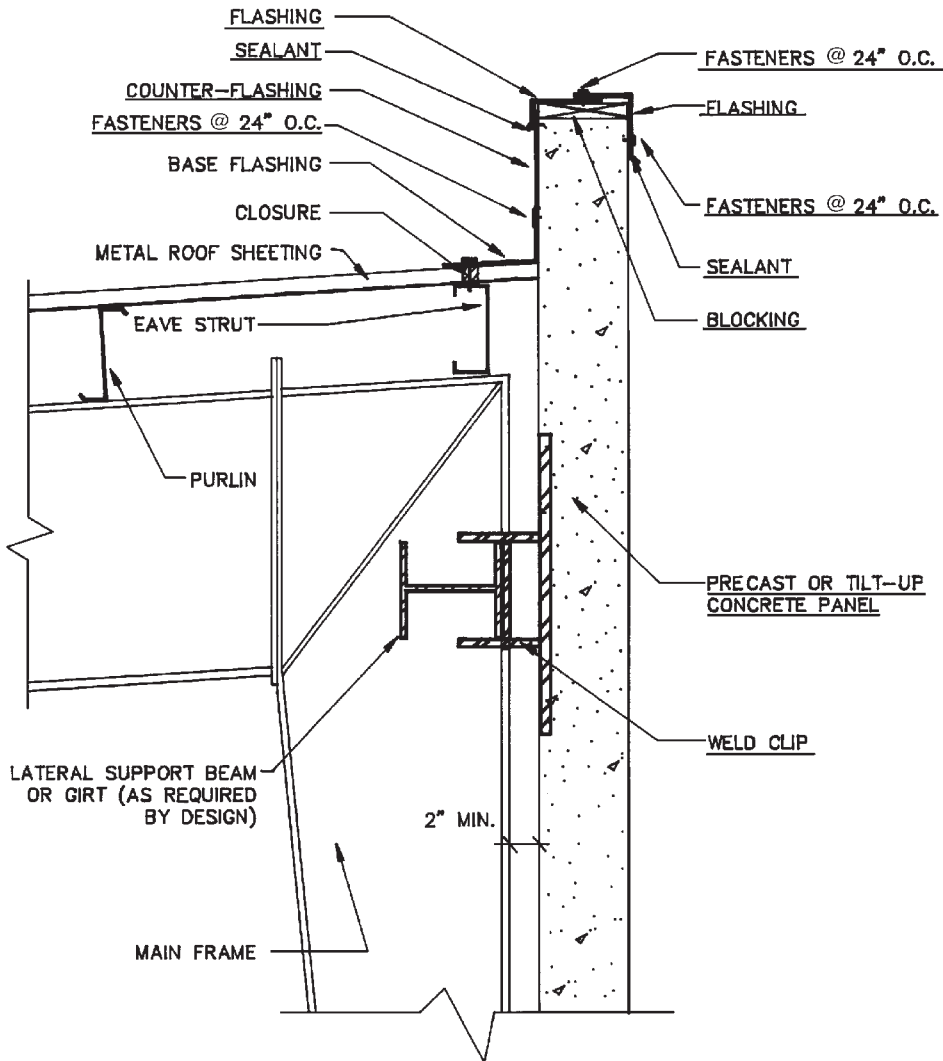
Connection at non-loadbearing precast panel. (Ceco Building Systems.)
